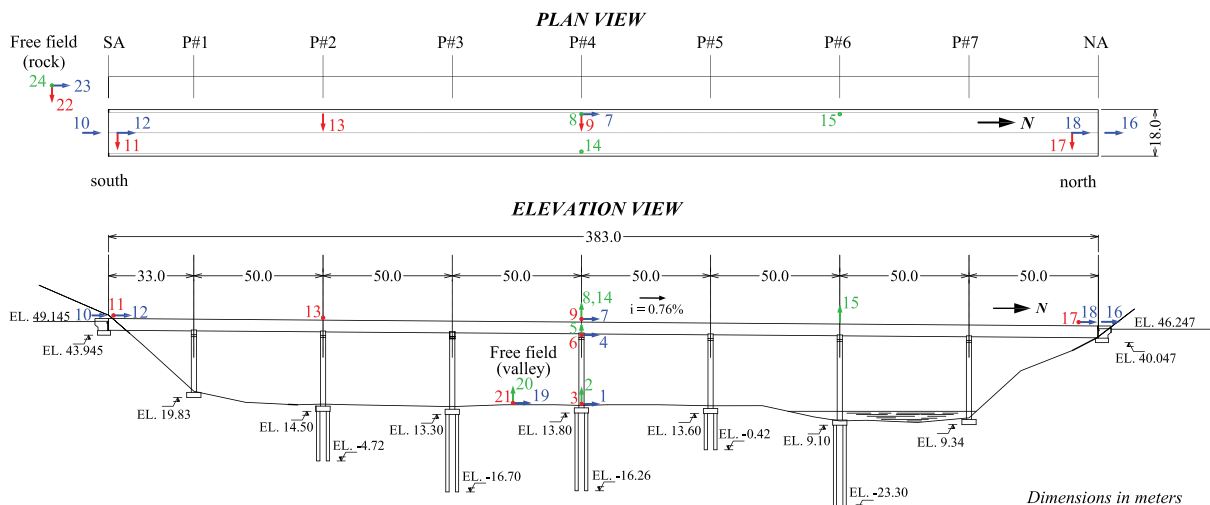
Plan and elevation views and instrumentation of the Marga-Marga Bridge. NA, North abutment; SA, South abutment [Colour figure can be viewed at wileyonlinelibrary.com]
